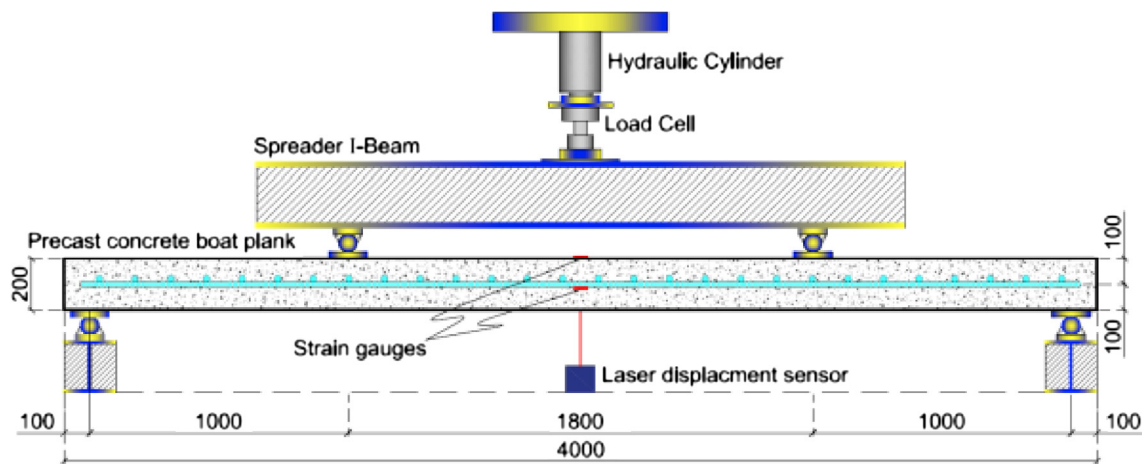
Flexural test setup and instrumentation for the precast RC planks.
